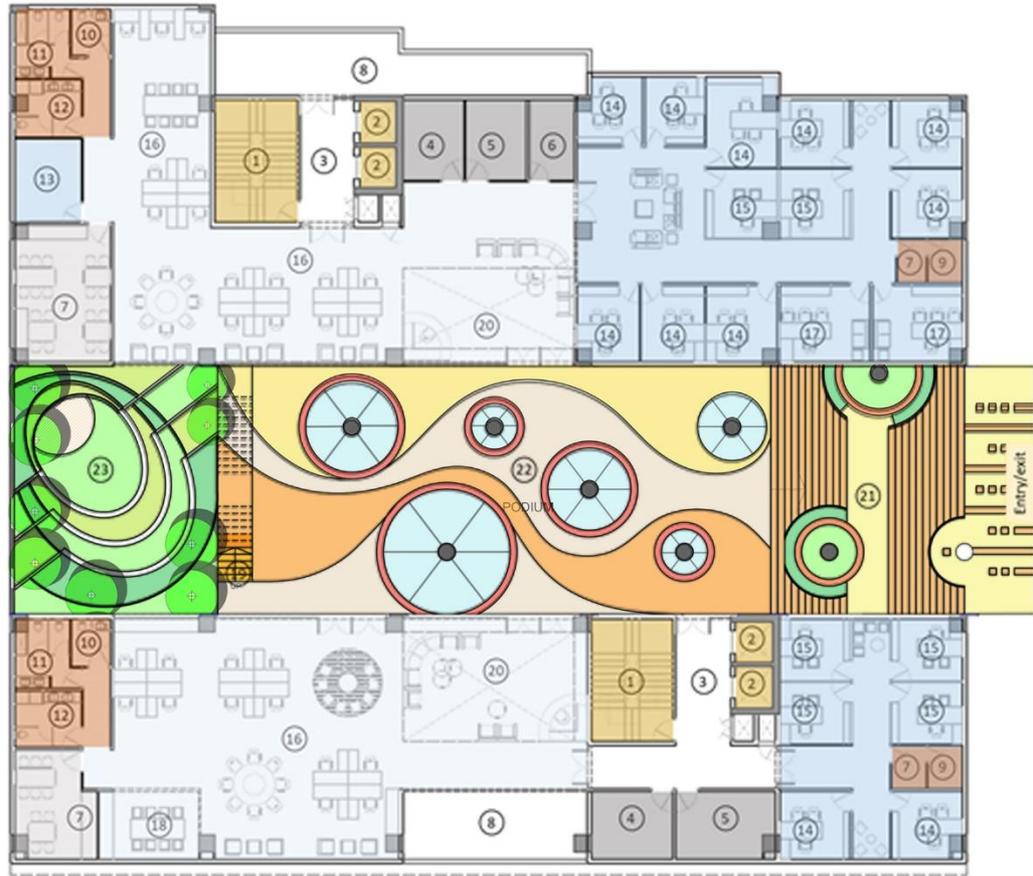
First Floor Plan (for podium details see annexure 6b)
